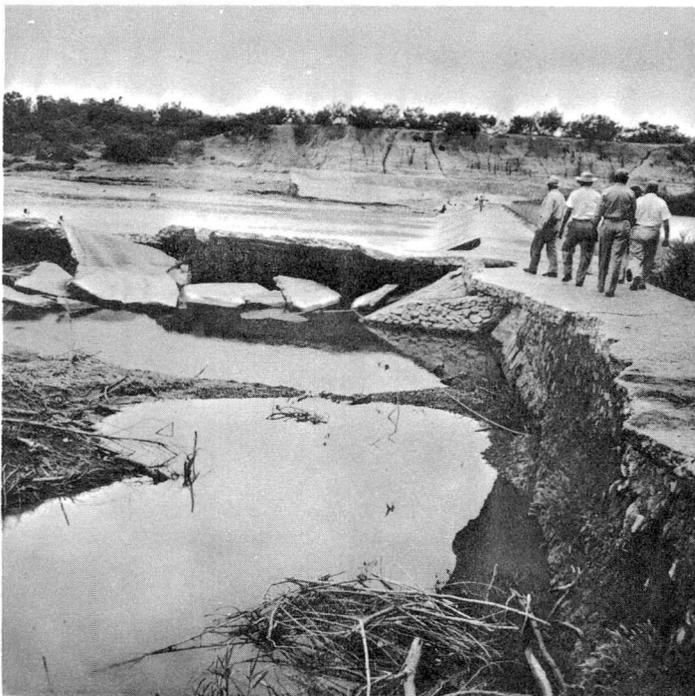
(left) Maverick Dam. River Bank in background is Mexico. The structure is a concrete masonry structure with a concrete cap.
